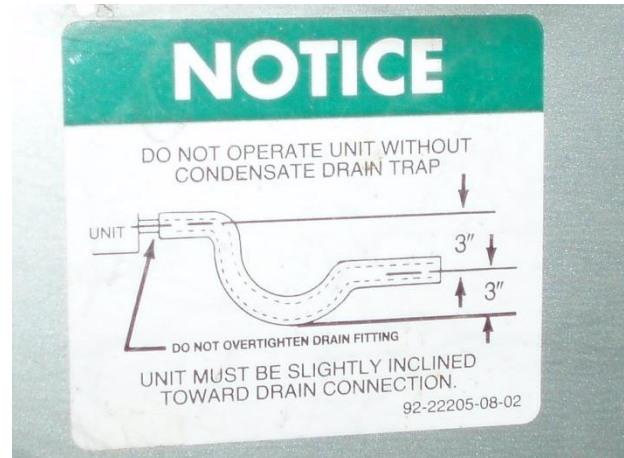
The furnace manufacturer recommends condensate traps to be constructed to the dimensions shown in this diagram.
